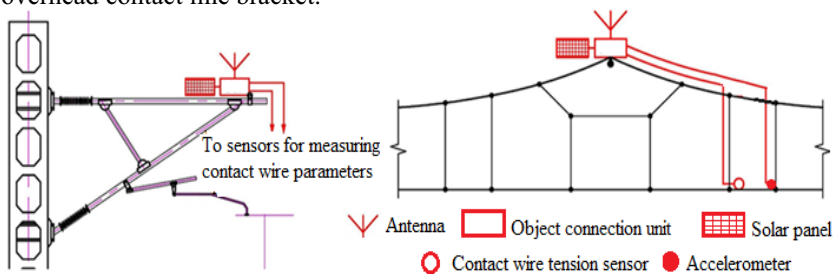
The installation scheme of contact wire tension and horizontal vibrations measurement device
